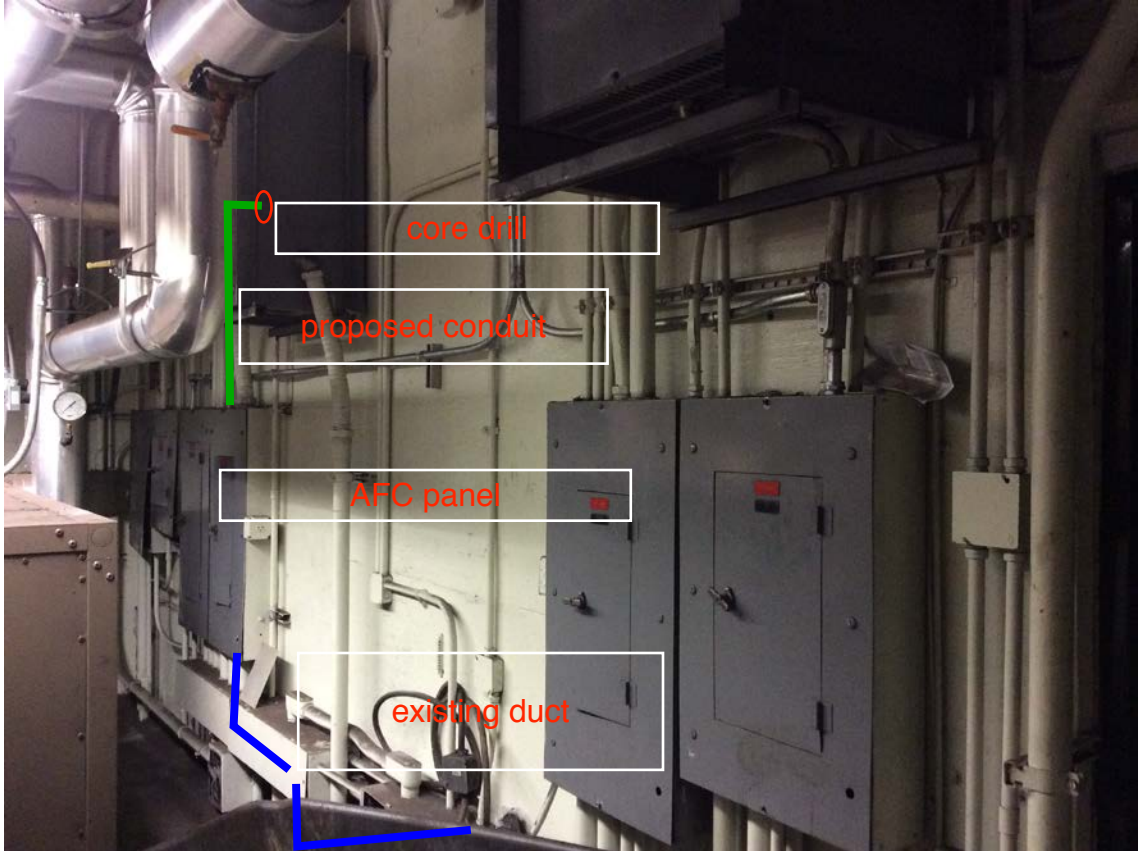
D05 Capitol South: Proposed overhead conduit into AFC panel and existing in floor duct run into junction box below AFC panel
